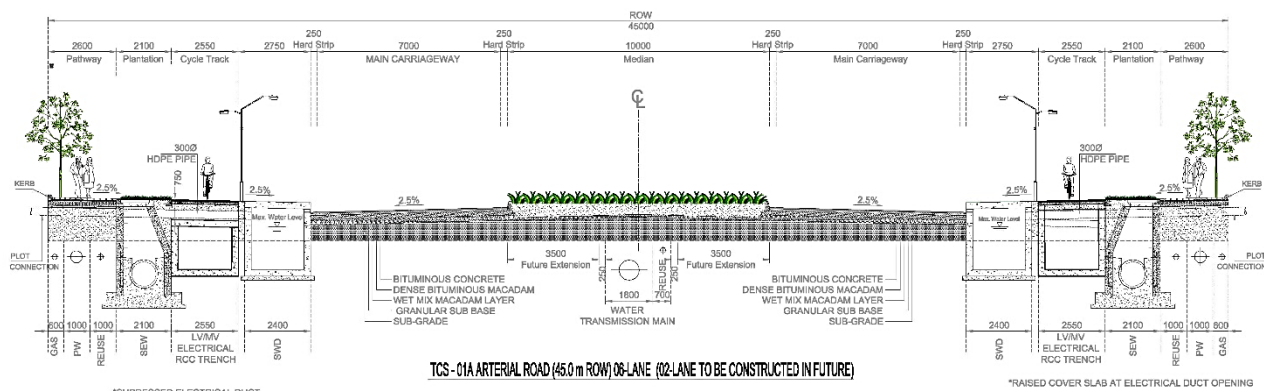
PROPOSED ROAD SECTION FOR KOPPARTHY INDUSTRIAL AREA -45M ROW (2 LANE TO BE CONSTRUCTED IN FUTURE)
